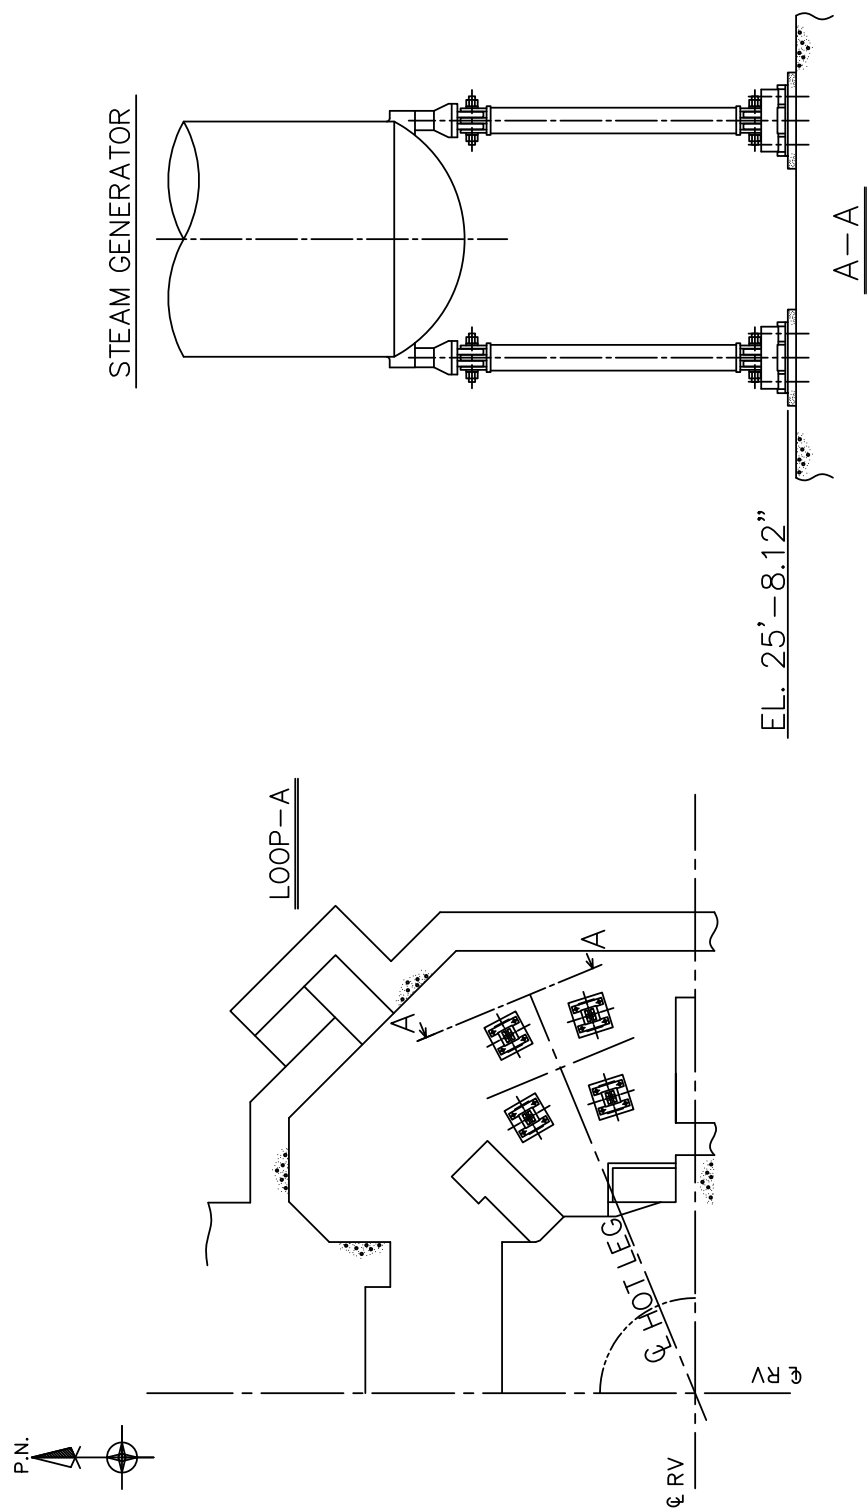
SG Support System (Sheet 4 of 4)
